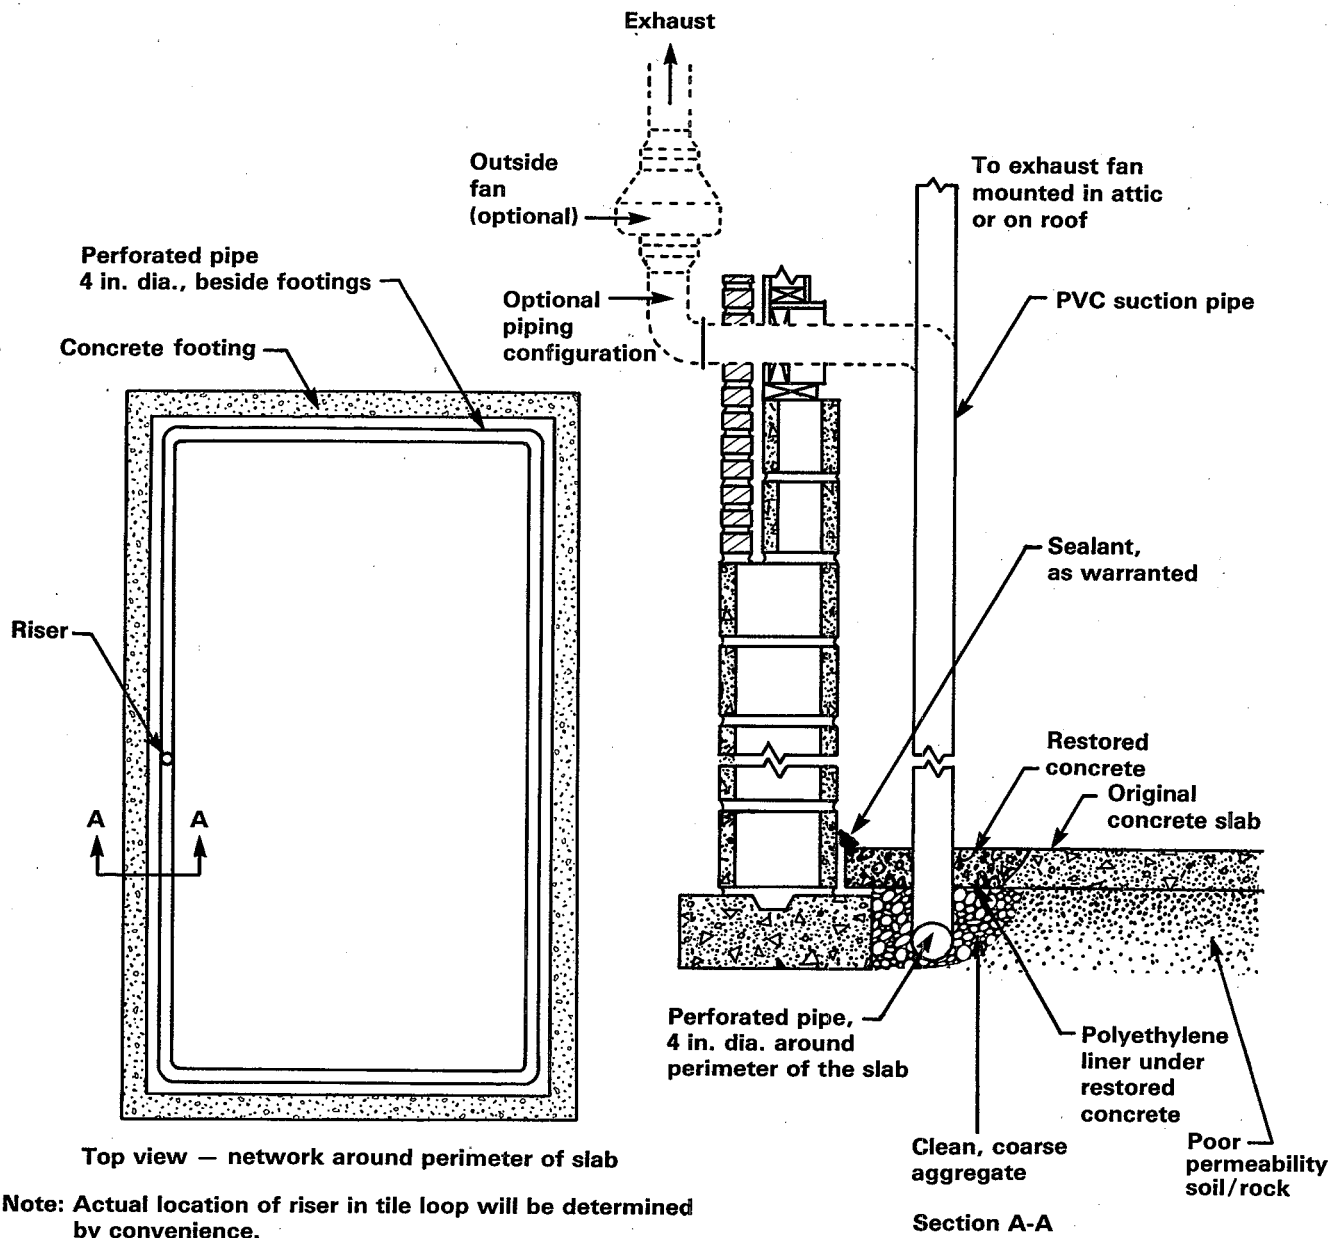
Retrofit of interior drain tiles under slab with poor sub-slab permeability (where only perimeter of original slab is torn up)
